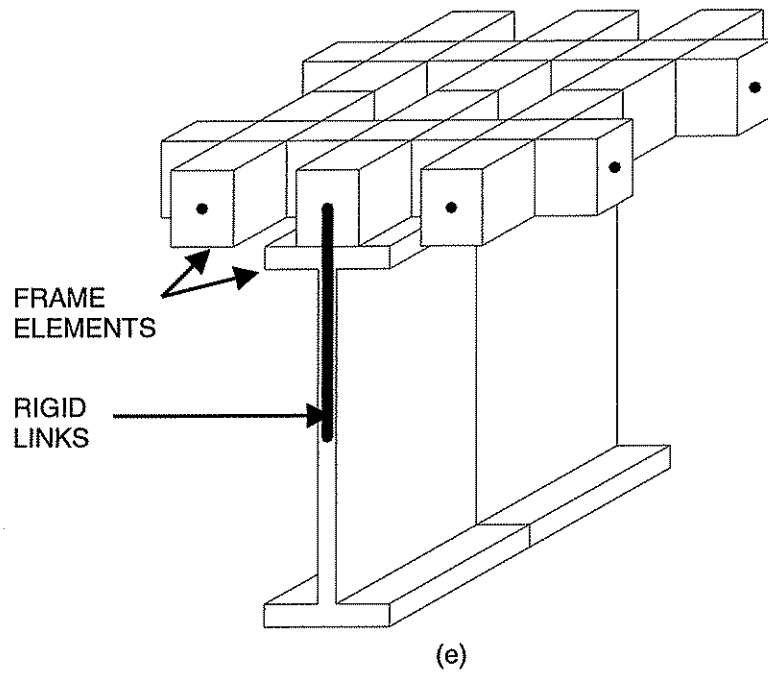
(Cont.). Previous finite element arrangements used to model composite action between a reinforced concrete deck and supporting steel girders: (e) O'Connell and Dexter (2001).
